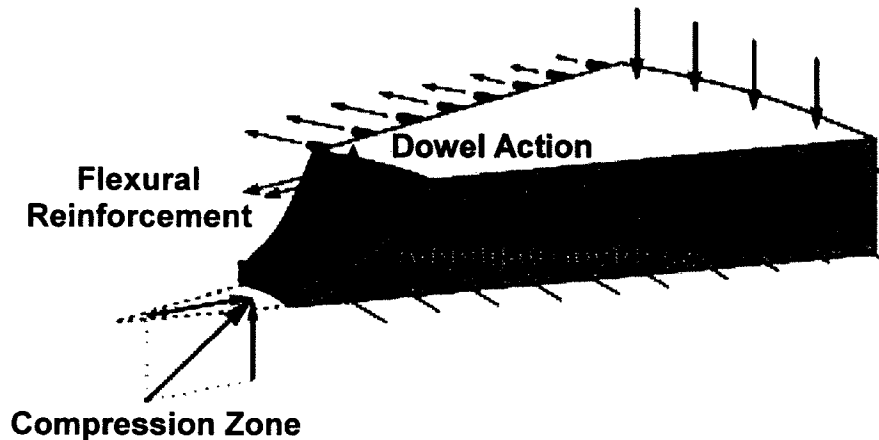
Shear failure mechanism in a cracked RC slab section without shear reinforcement (Adapted from Muttoni 2008).
